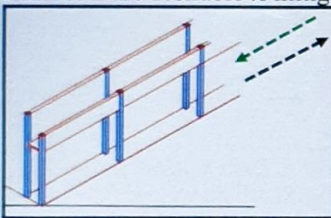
(a): Isometric view of factory R.C roof gutter to stabilize the R.C roof gutter
